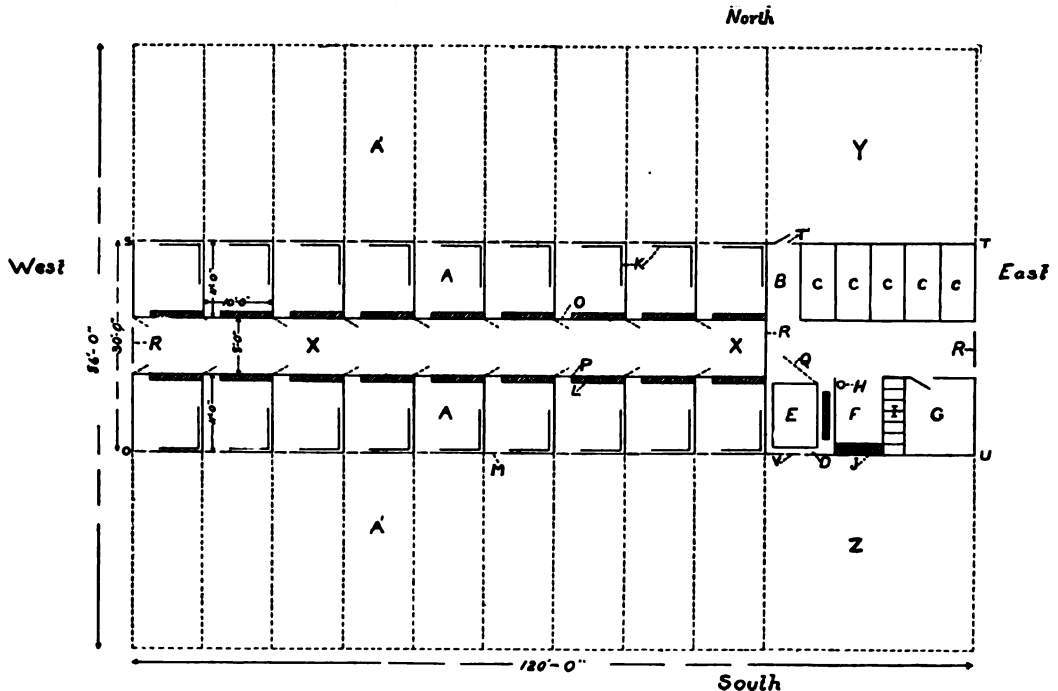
Ground plan of a hoghouse built at the Illinois Experiment Station. It is arranged to economize labor. The long dimension of the house is east and west, permitting the sun to enter the side of the building. (See also Figs. 341 and 342.)
